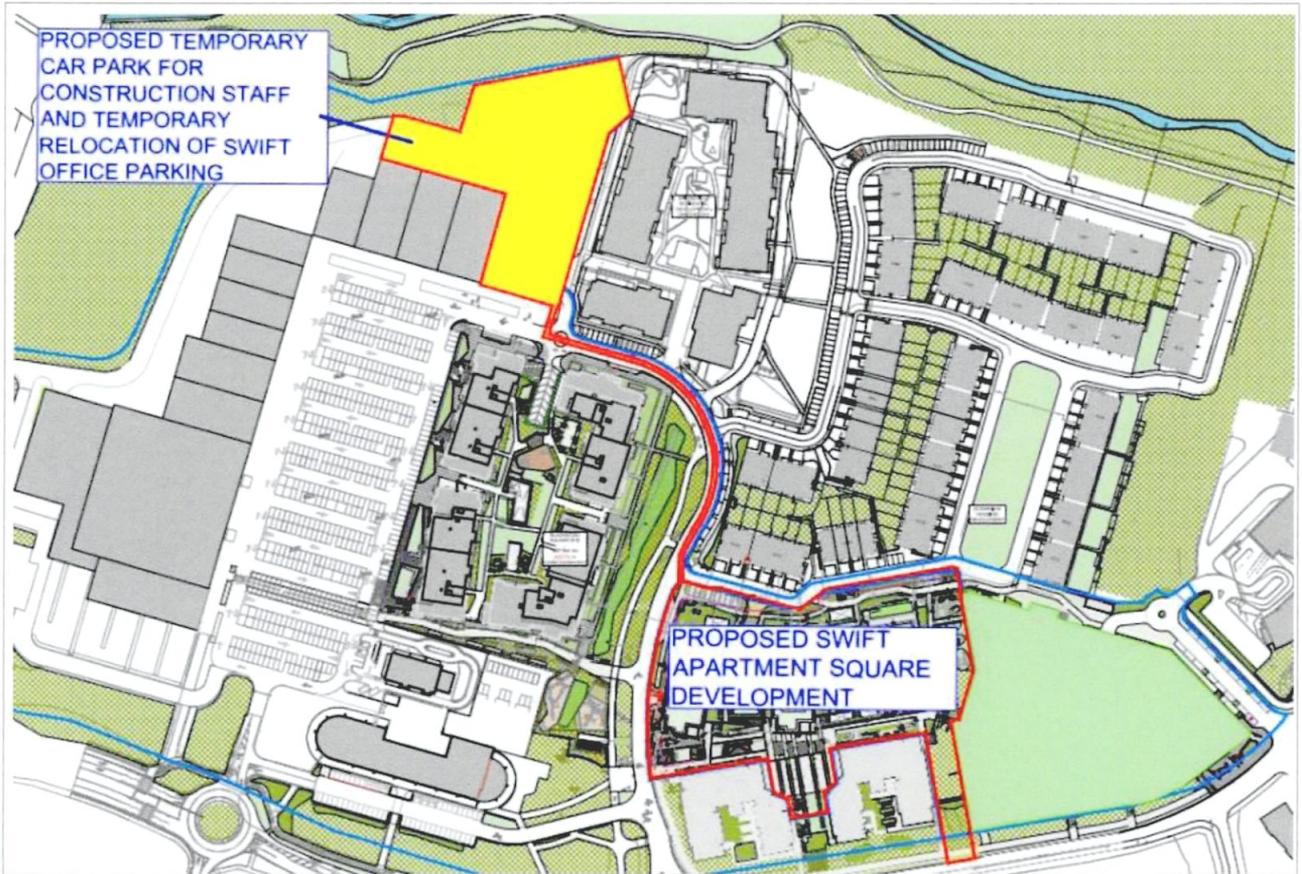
Temporary construction staff and Swift Square Office personnel car parking
